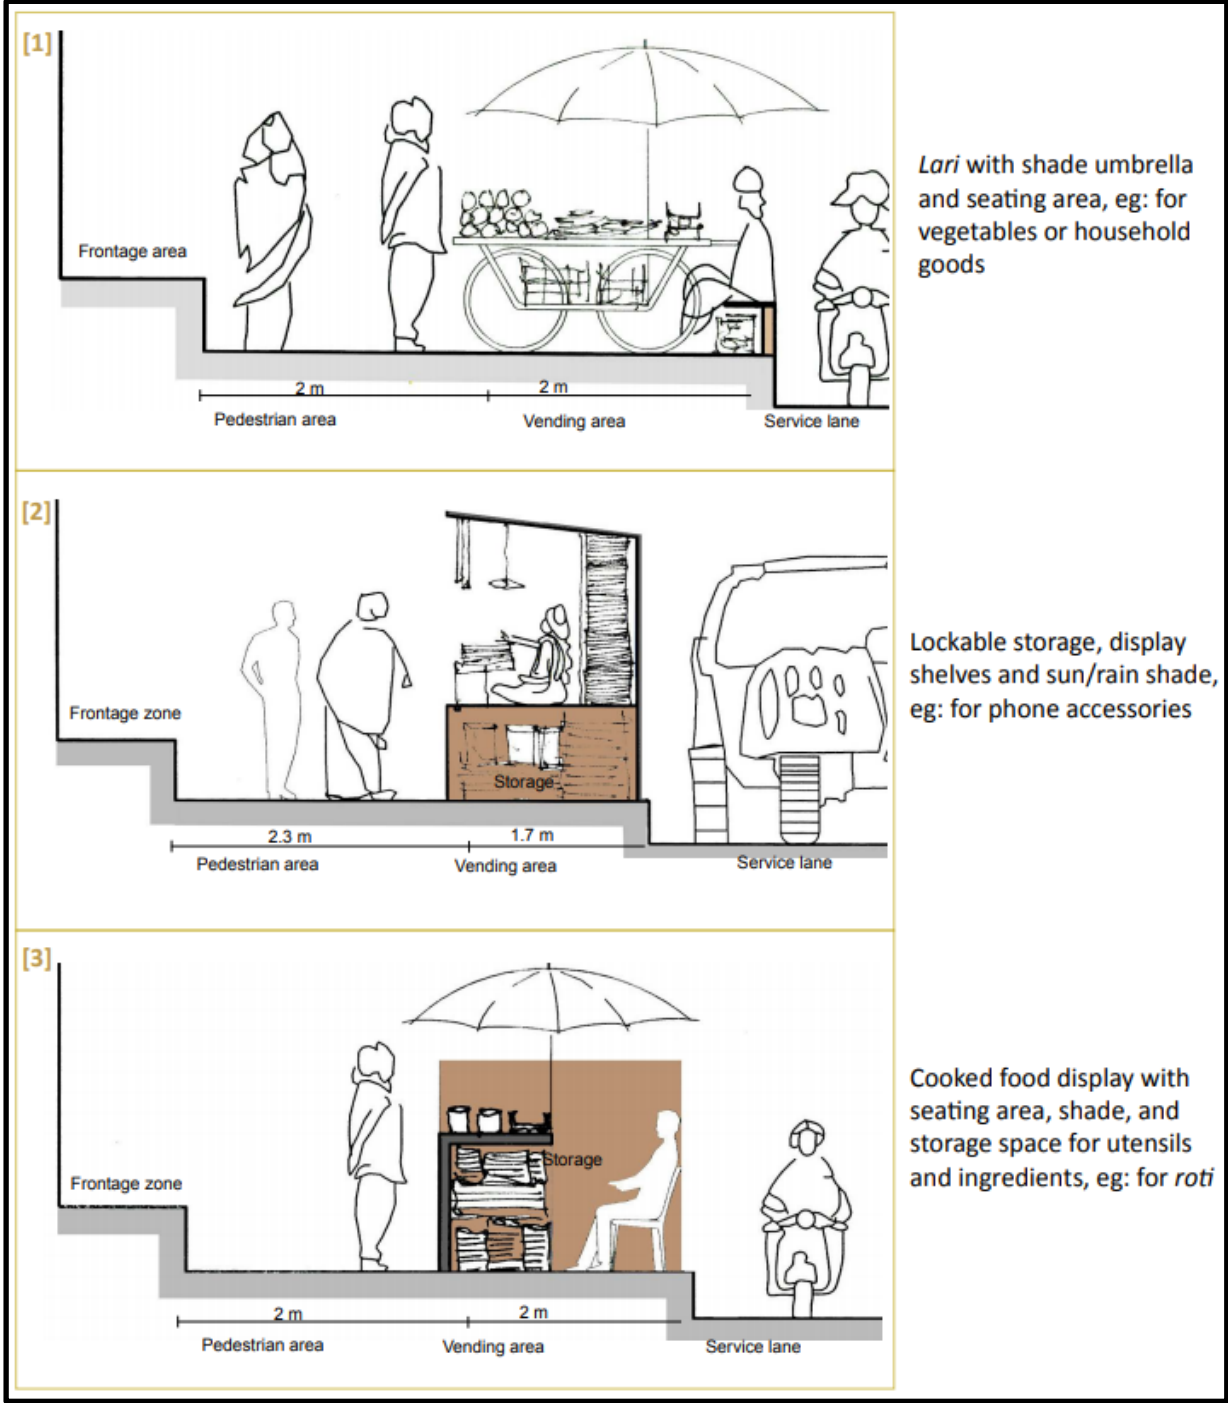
Inclusive design for street vendors in India - Pavement elevation and street design
